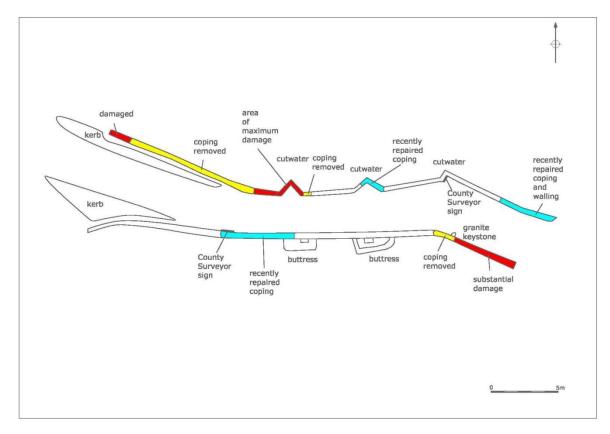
Plan of bridge, detailing damage (red-severe, yellow-slight) and repairs (blue).
